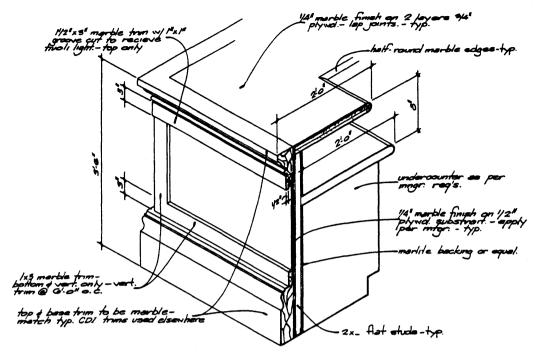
Millwork Detail Drawing With Annotations Including Dimensions, Construction Materials, and Finish Notes (Kilmer & Kilmer, 1992, p. 567).
